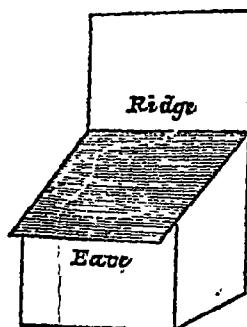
is a sketch of a lean-to roof. The shaded portion is the roof.
